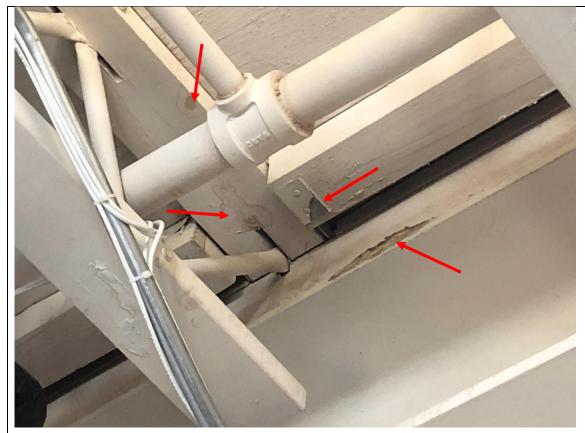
Water stains and failing paint on the ceiling in the multipurpose room.
